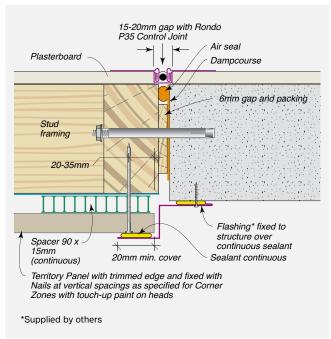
Typical Abutment with In-line or Out-set Masonry Wall – Plan View
